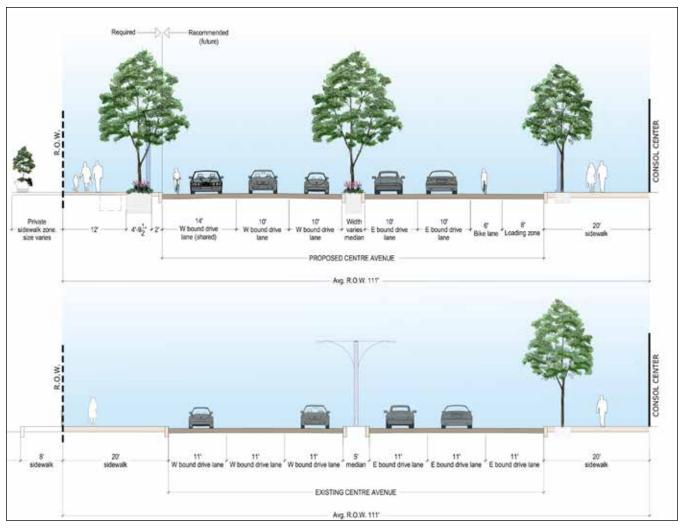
Centre Avenue Section F-F' (approaching Washington Place)
